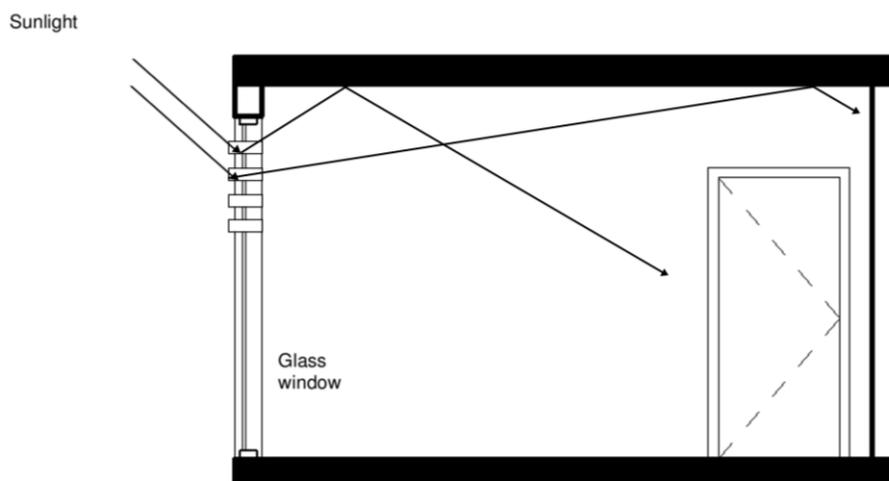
Prismatic Glazing Daylight Strategy on Building Daylight (Author, 2021)
